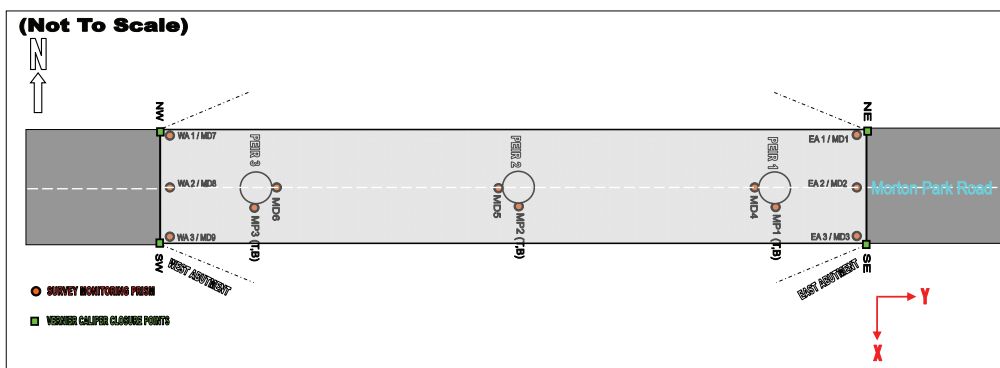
Plan of the relative 3D monitoring points on Moreton Park Road Bridge (South) (Source: IMC)
